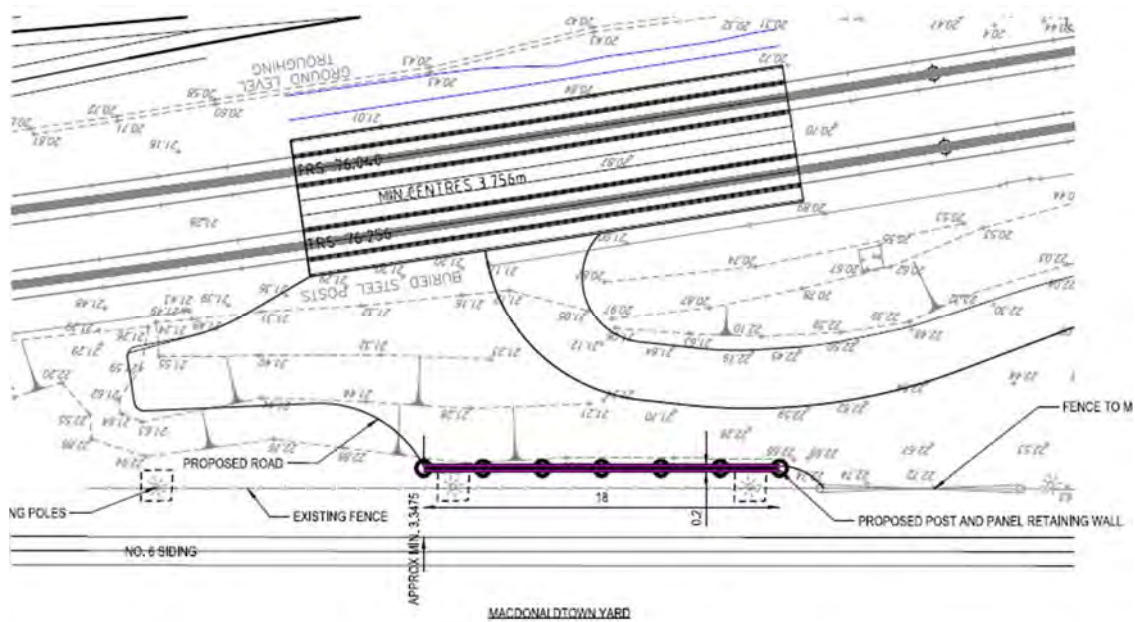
Preliminary sketch of the proposed post and panel retaining wall. (Source: Transport for Tomorrow, 2024)
